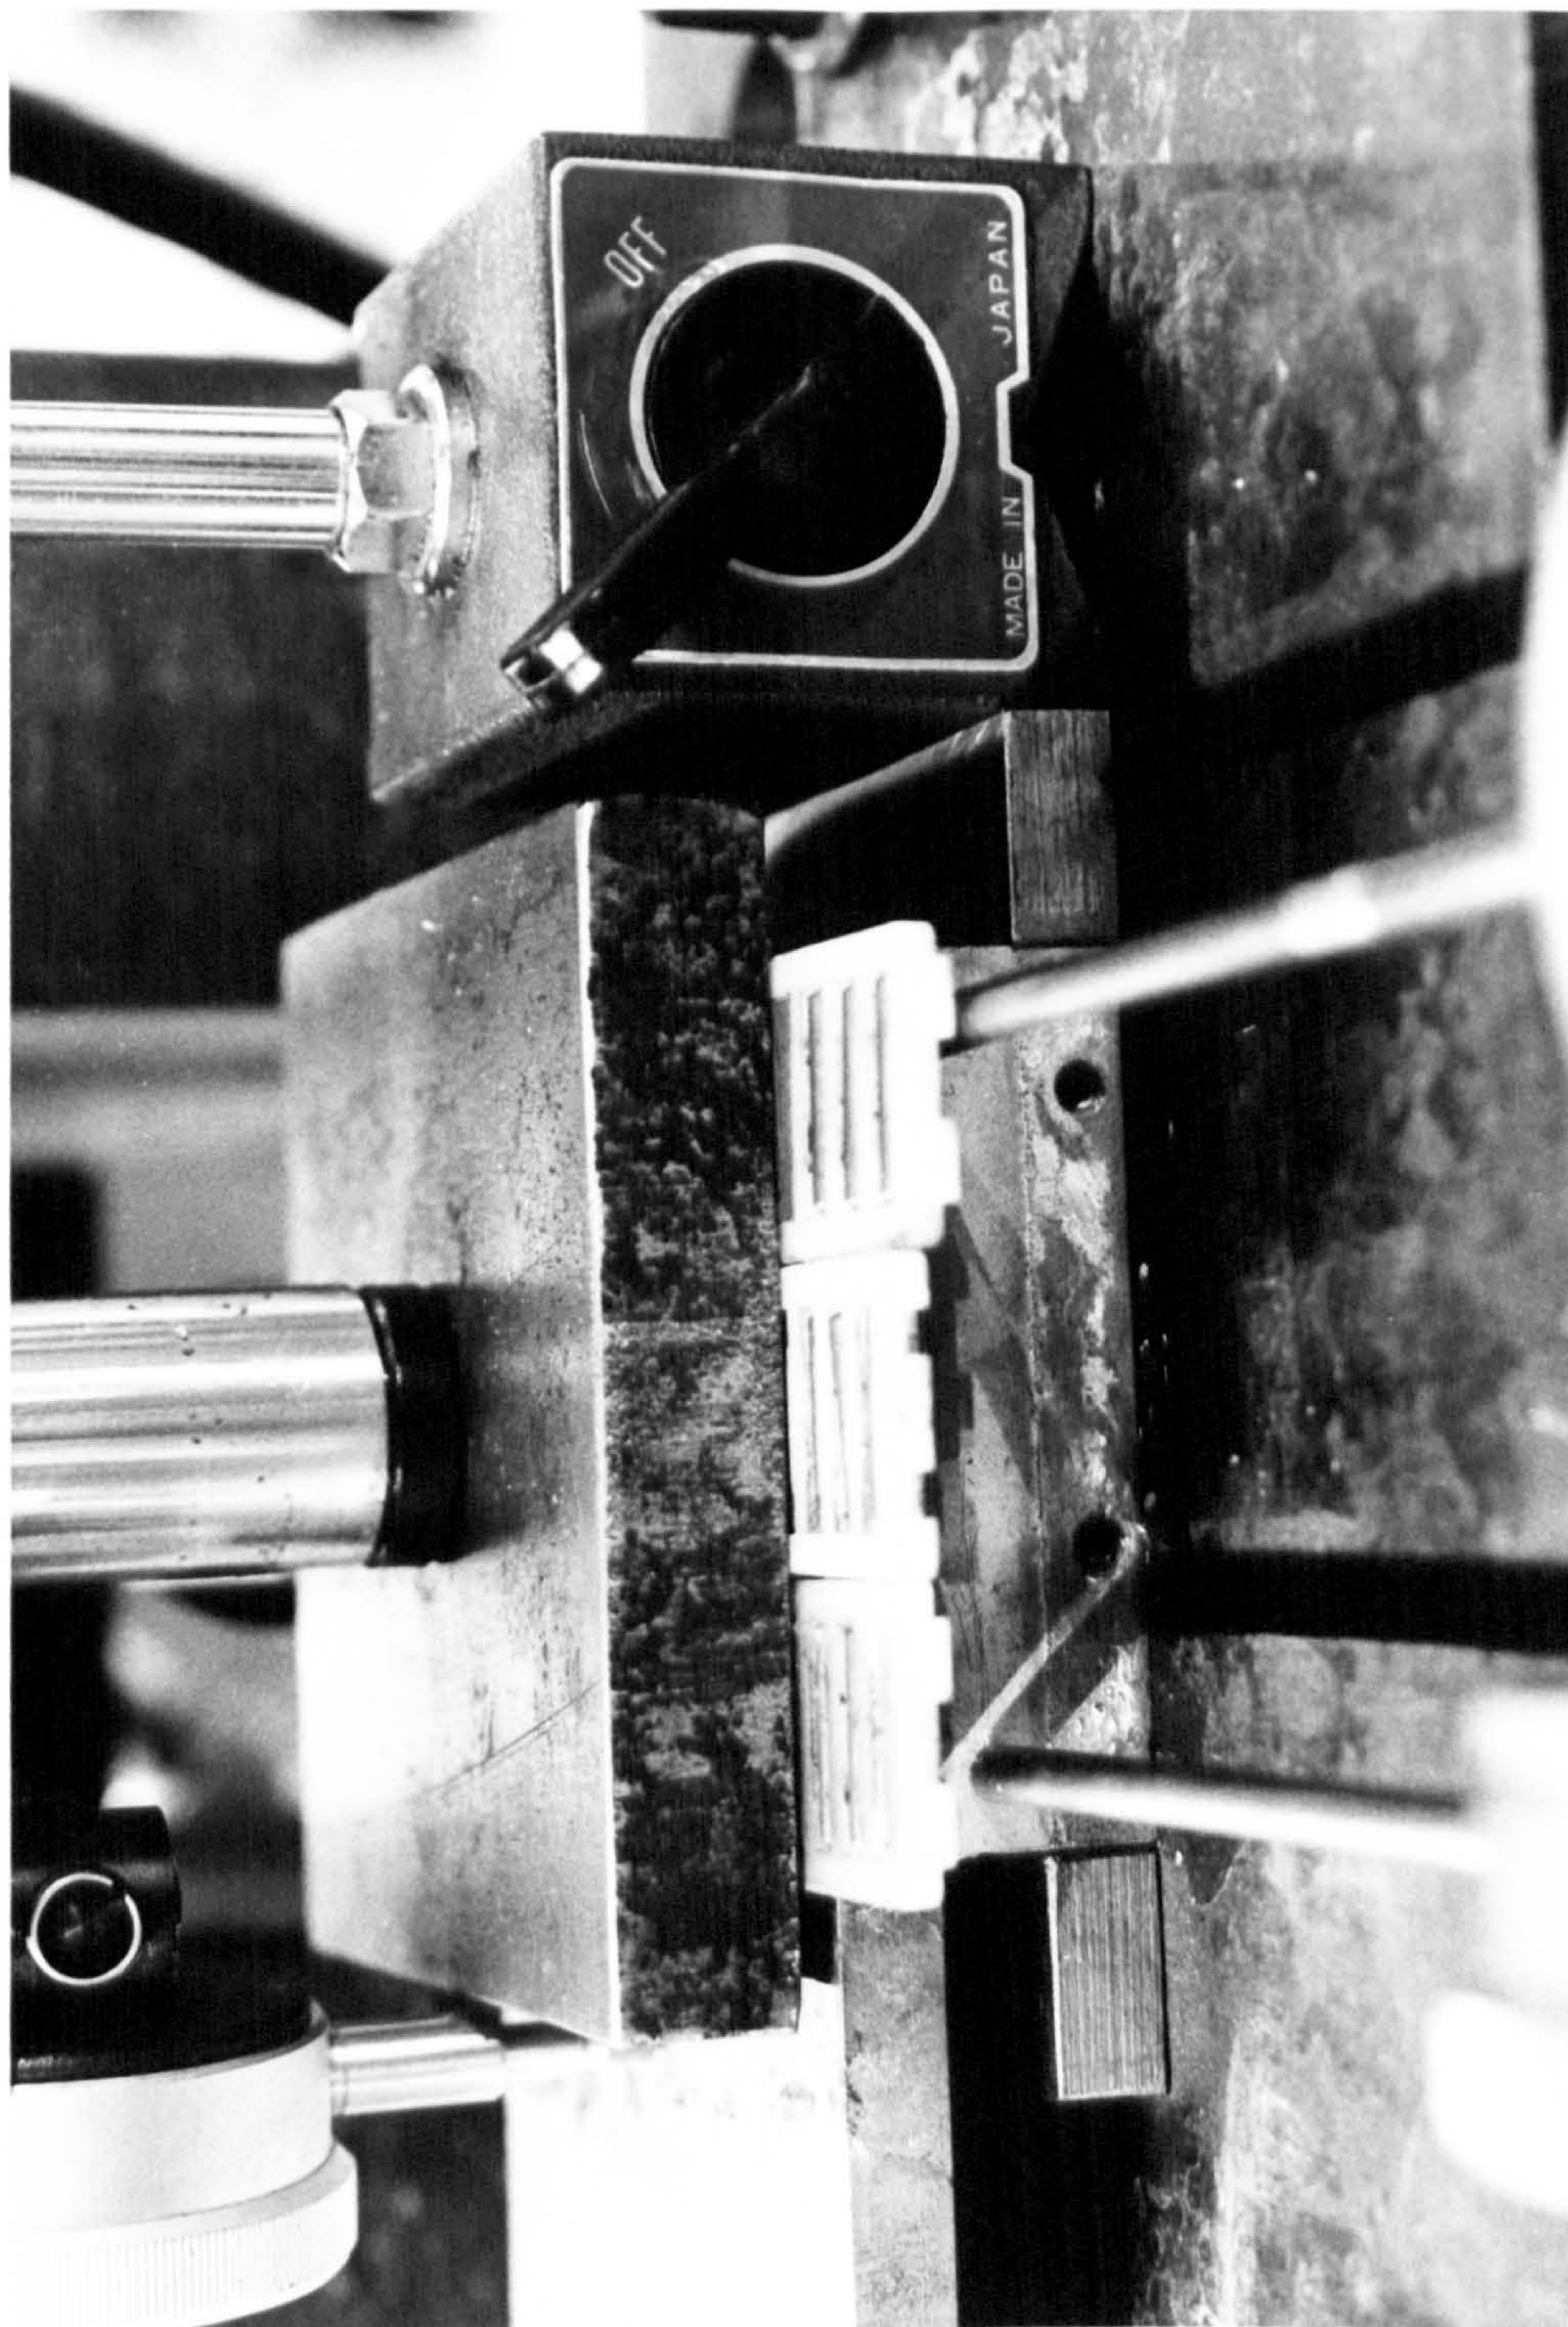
CLOSE-UP VIEW OF THE TEST SPECIMEN BEFORE LOADING.
